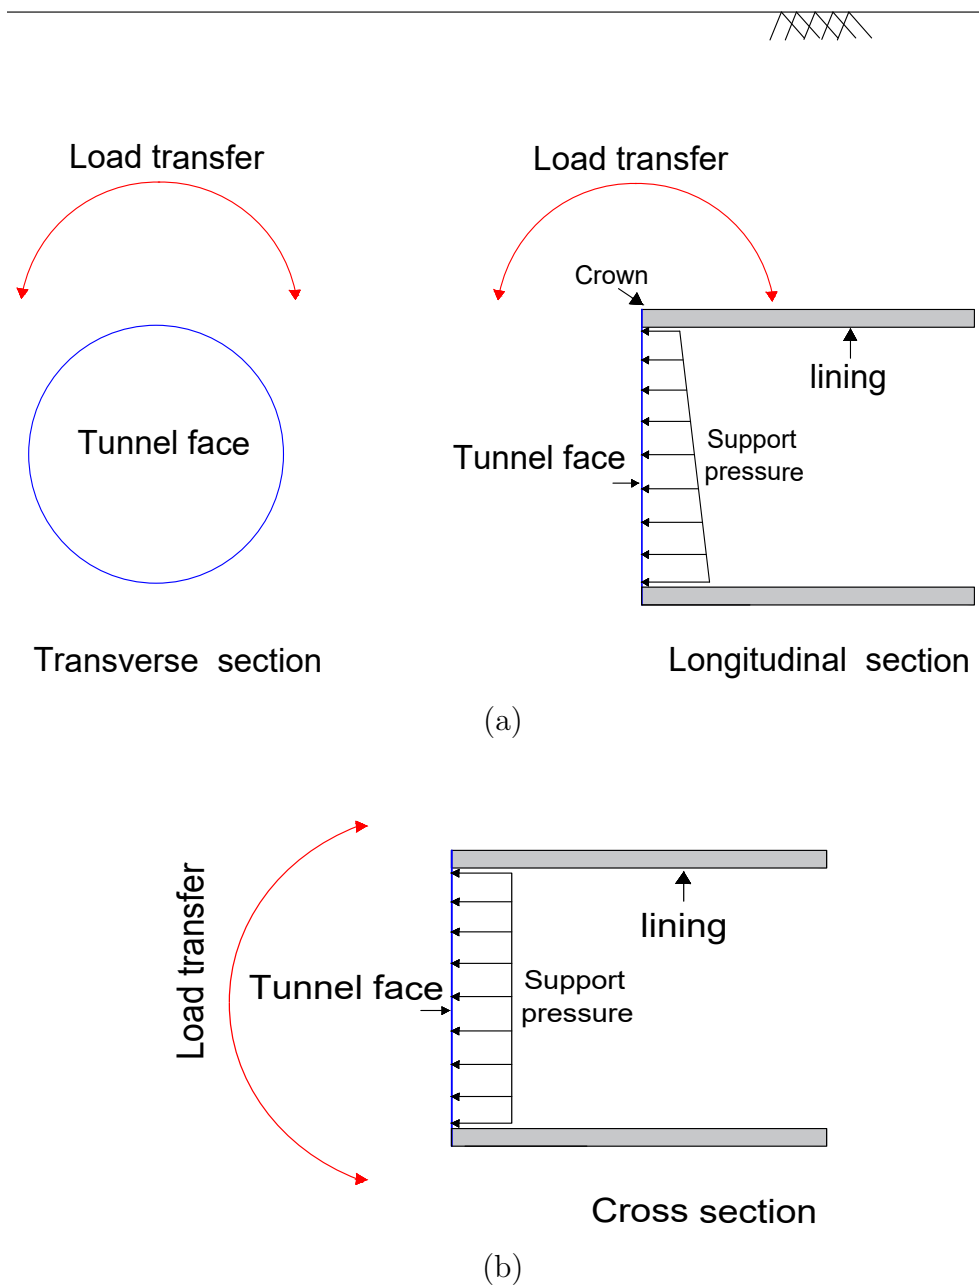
Vertical and horizontal arching during excavation of the tunnel: (a) vertical arching above the tunnel face; (b) horizontal arching at the front of the tunnel face
